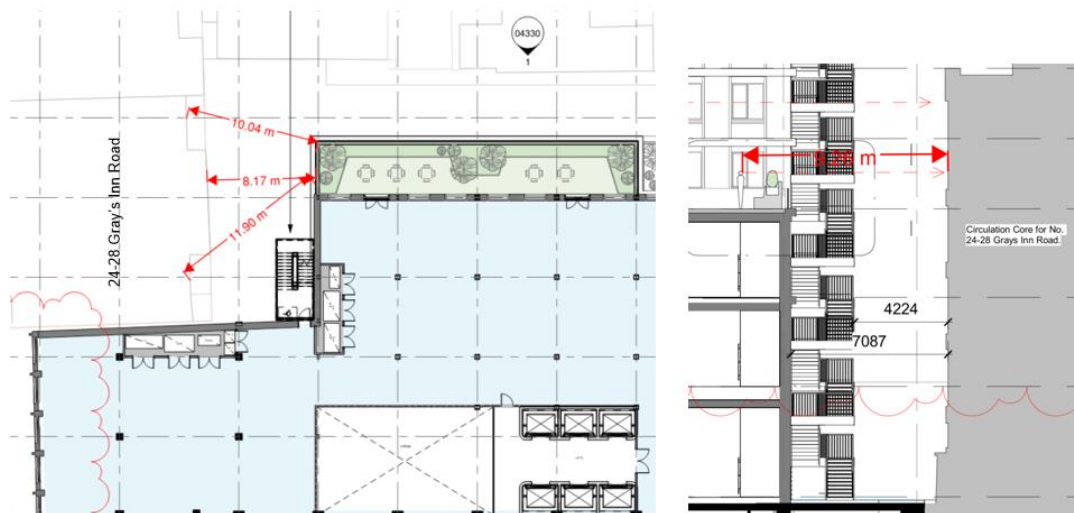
Proposed 2nd floor plan (left) and section (right) showing separation distance from roof terrace to rear elevation of no. 24-28 Gray's Inn Road
